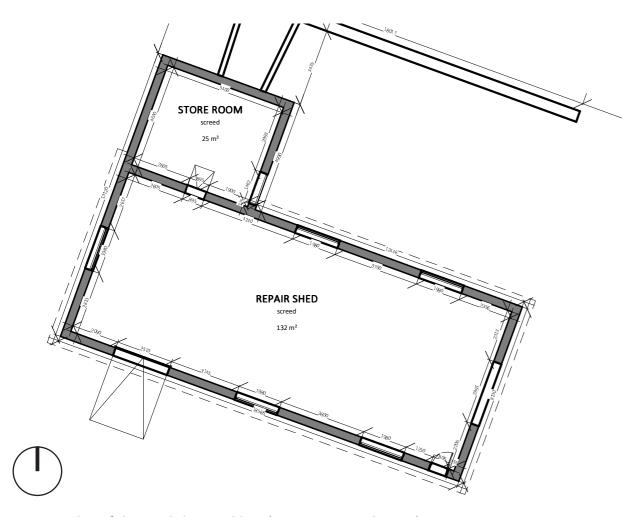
Plan of the Workshop Building (Mayat Hart Architects)
